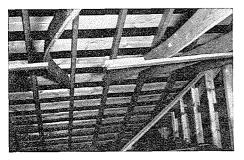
Failure in Splice of 1- by 4-in. Longitudinal Member and Buckling of Collar Ties in Attic under 143 per cent of Design Snow Load.
